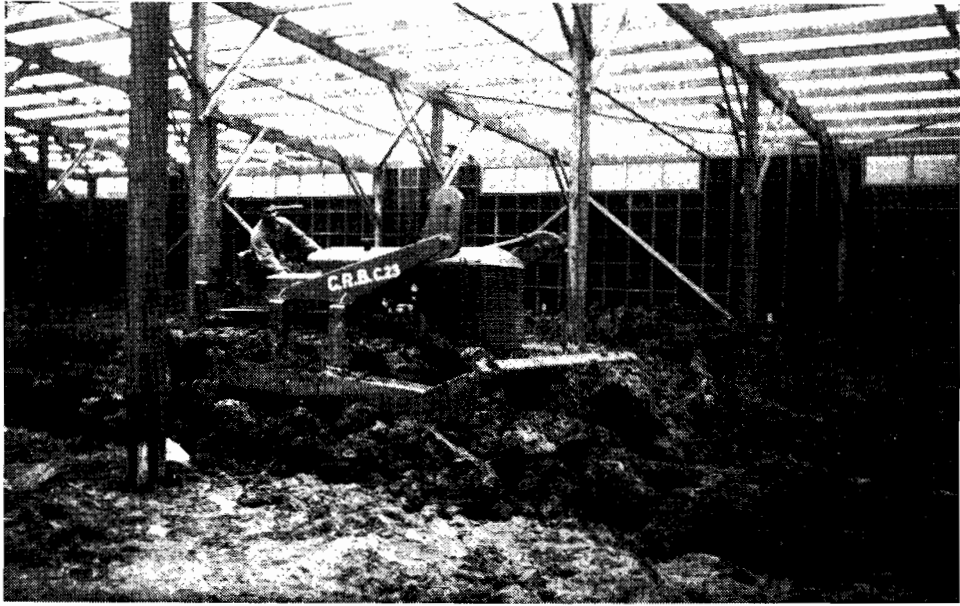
Levelling floor of Allied Works Council store, Melbourne, in preparation for construction of pavement.
